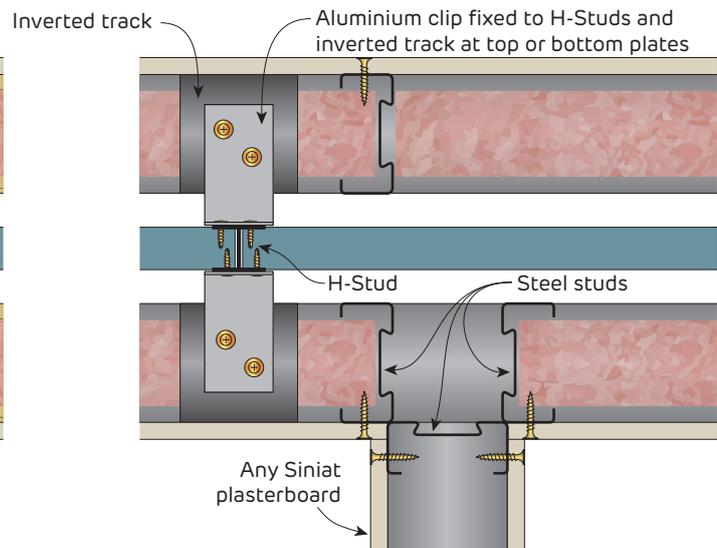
Interhome Wall with Non-Fire Rated Intersecting Wall
